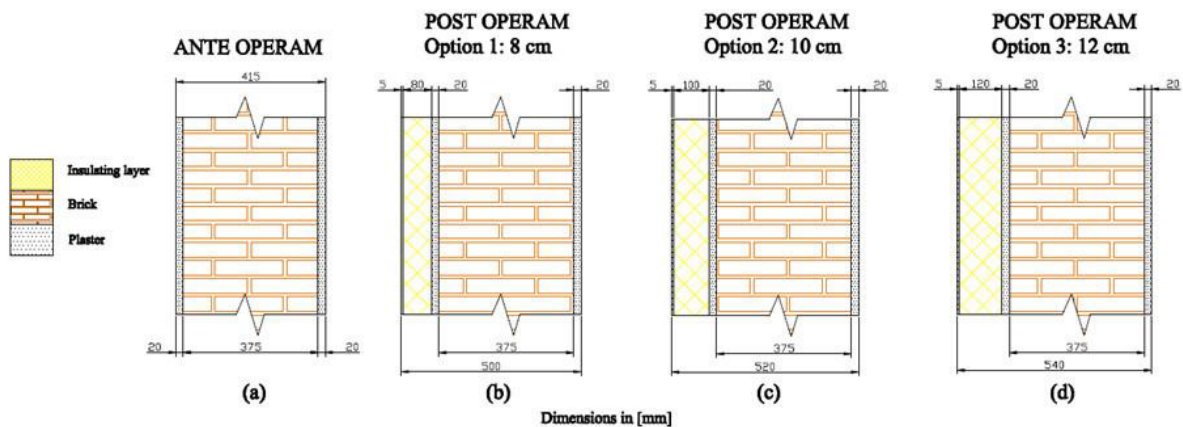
Building envelope: current situation (a) and future improvements (b, c, d).
